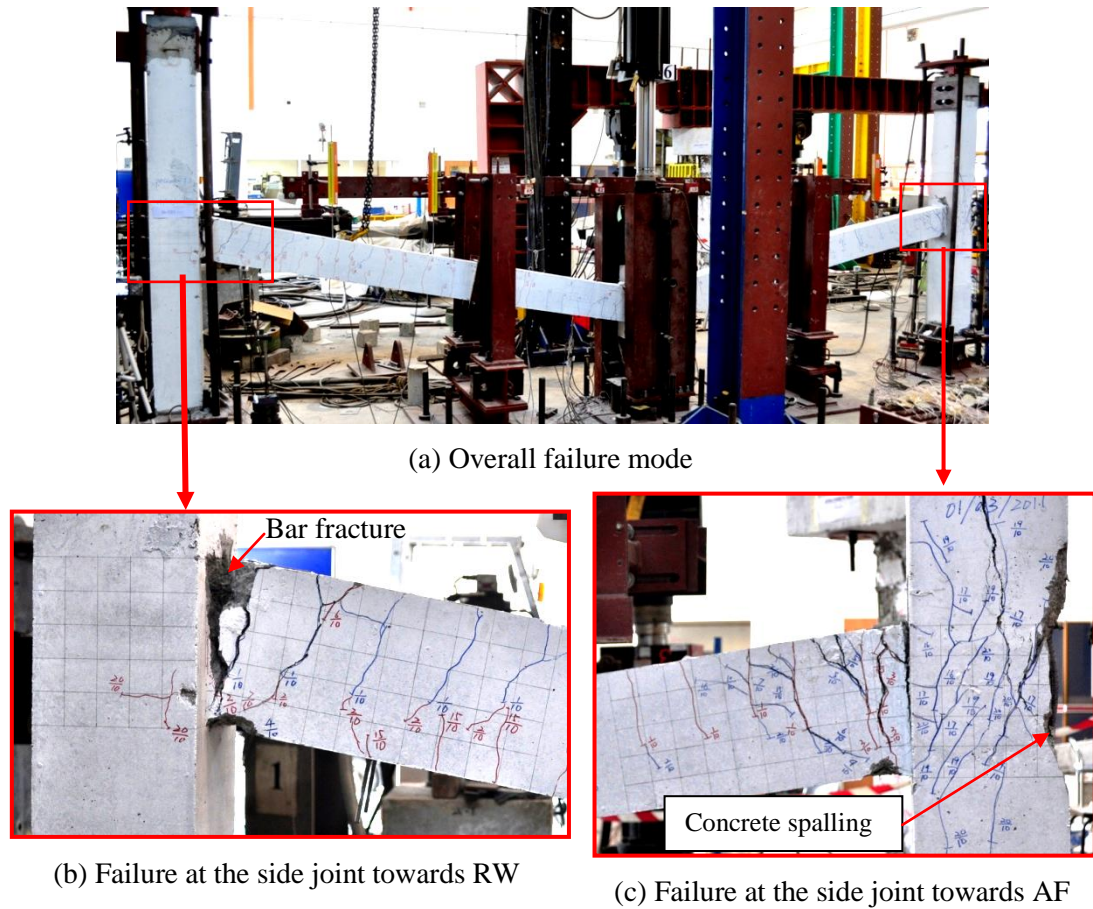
Failure modes of specimen F3-CD-NS-EX
